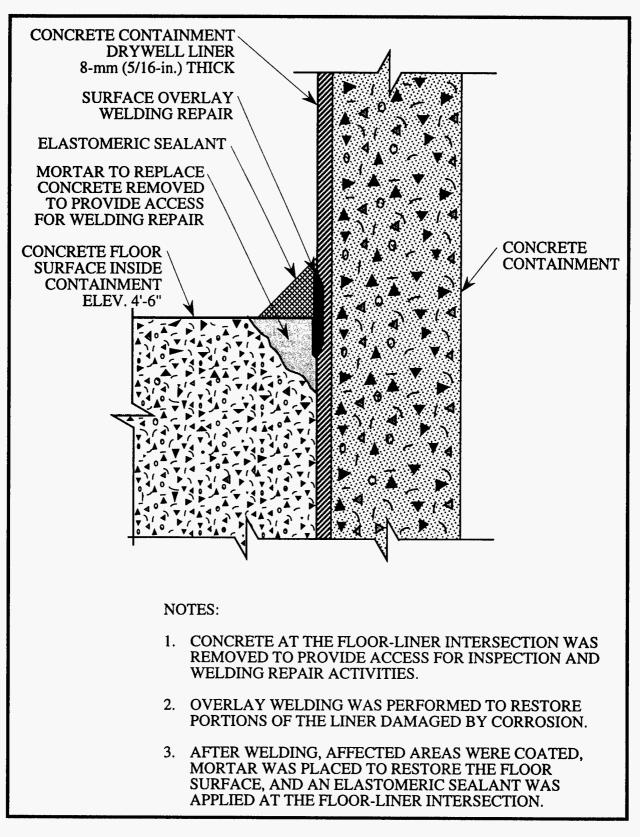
Cross-sectional view of the drywell liner repair performed inside the Brunswick, Unit 1 concrete containment.
